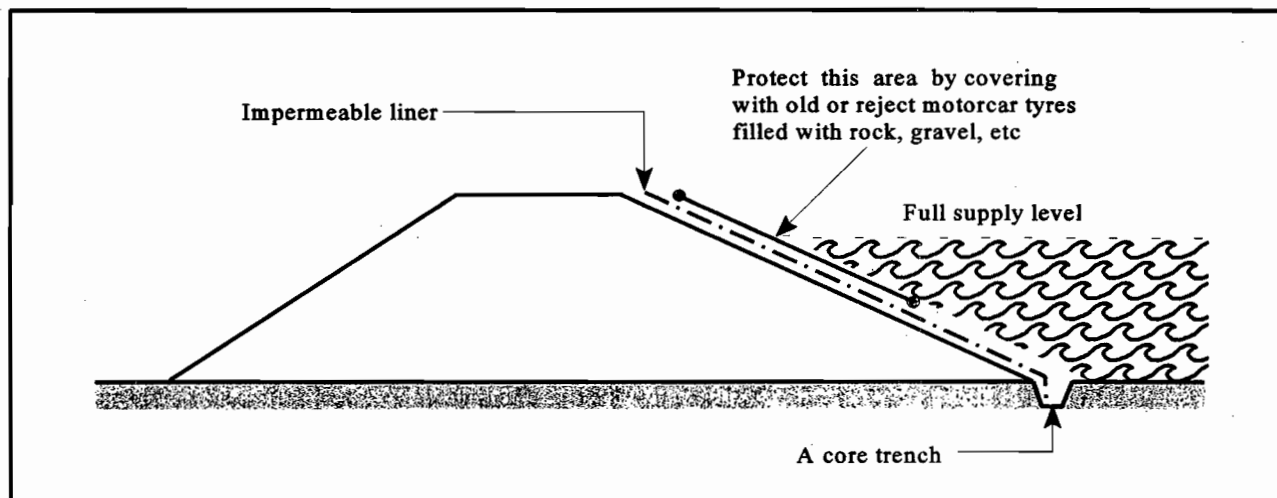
Fitting an impermeable liner to a dam wall to stop seepage through the embankment
